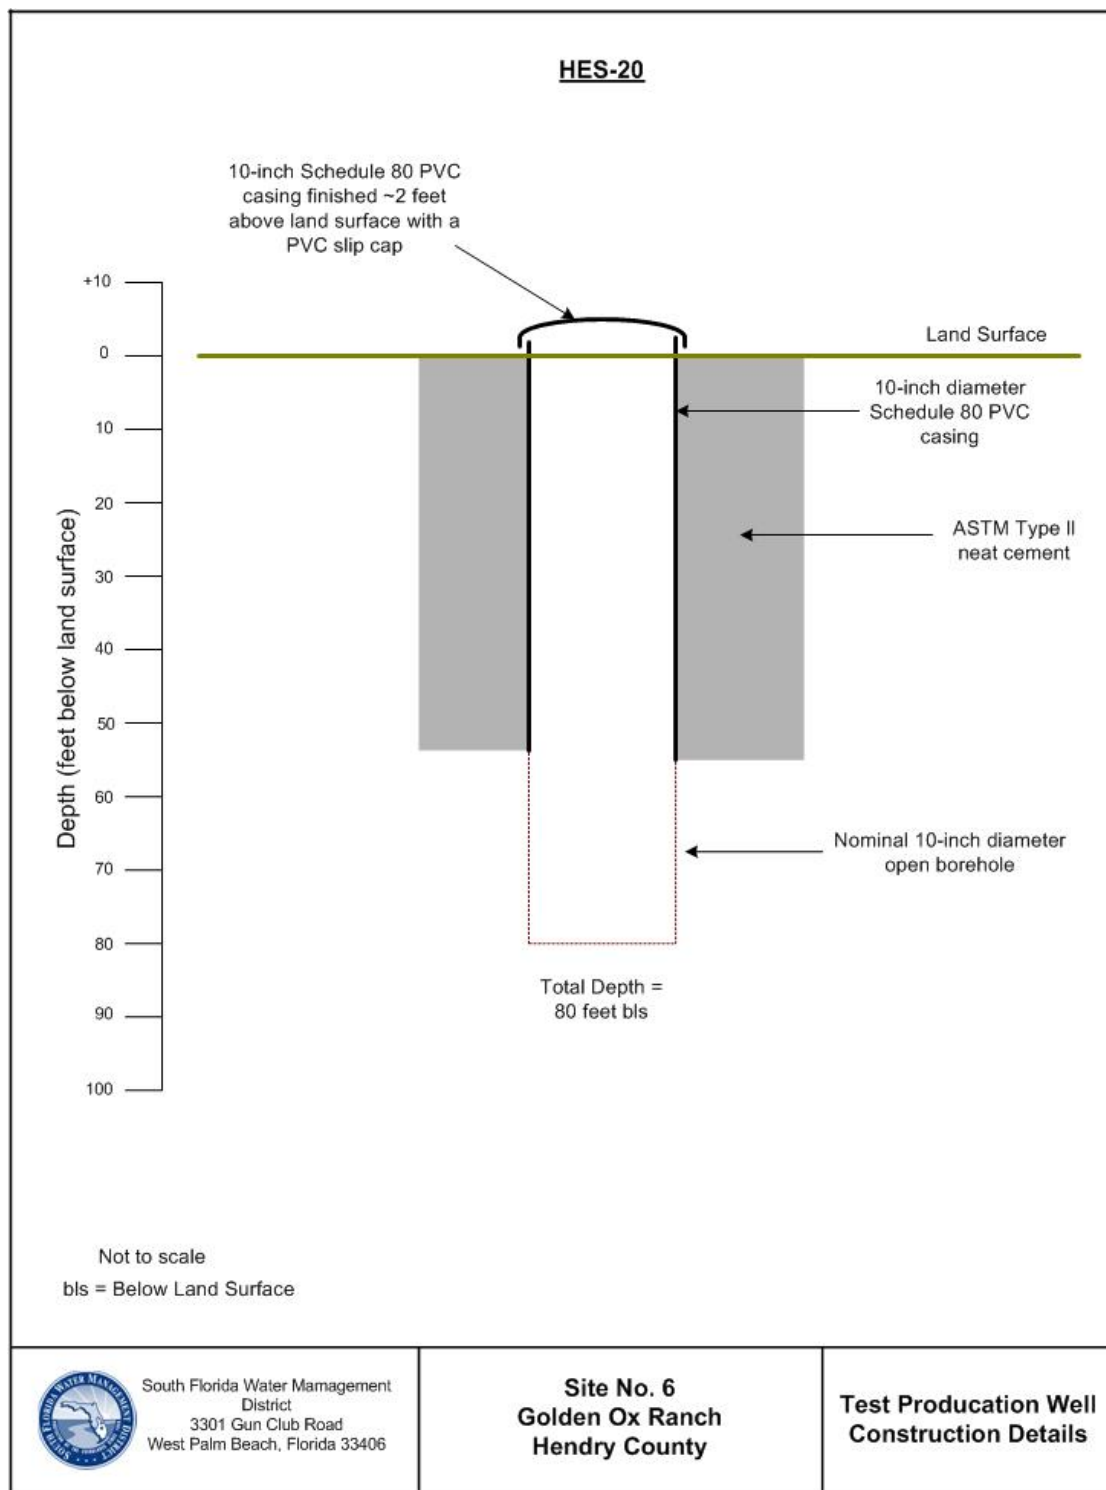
Site No. 6 APT Test Well Constructions Details.
